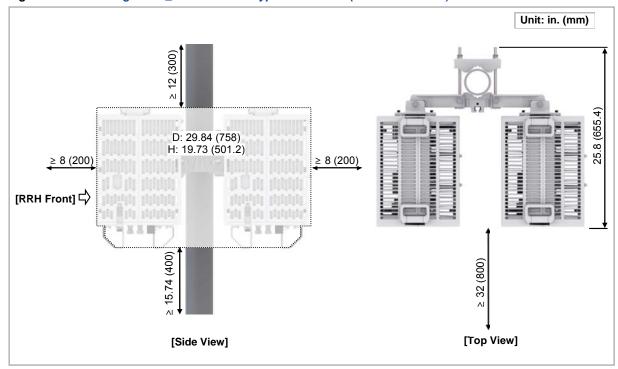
RRH Arrangement\_2 Sector Pole Type Installation (Side Installation)
